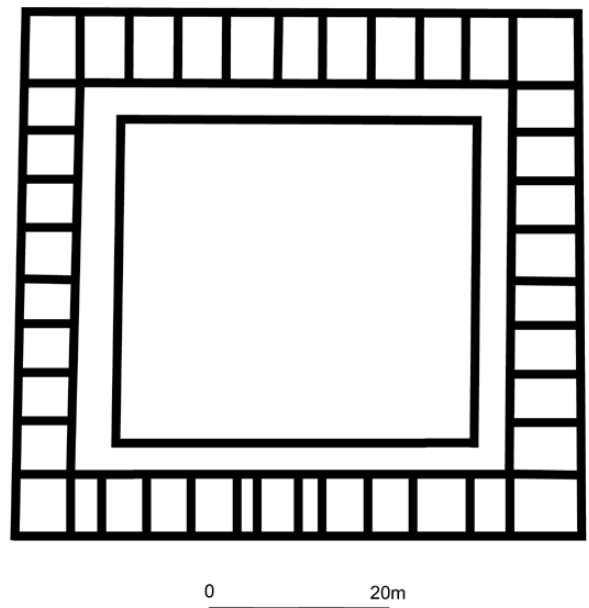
Reconstruction of the Priory Field store's ground plan
